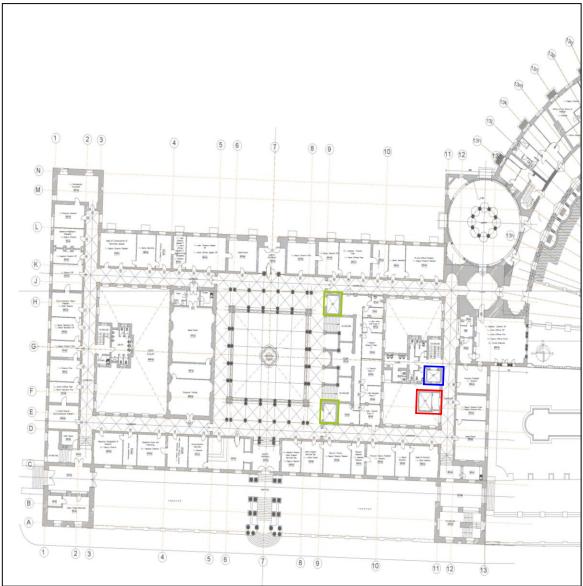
\_Union Buildings\_Ground floor plan with description of all building sections (Source: Drawing Ikemeleng Architects, 2017)
